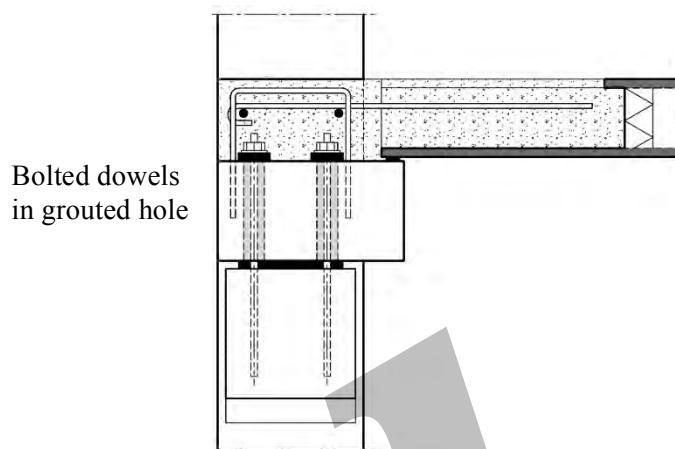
Connection between hollow core floor element and edge beam where the torsion is taken up by the support connection.
